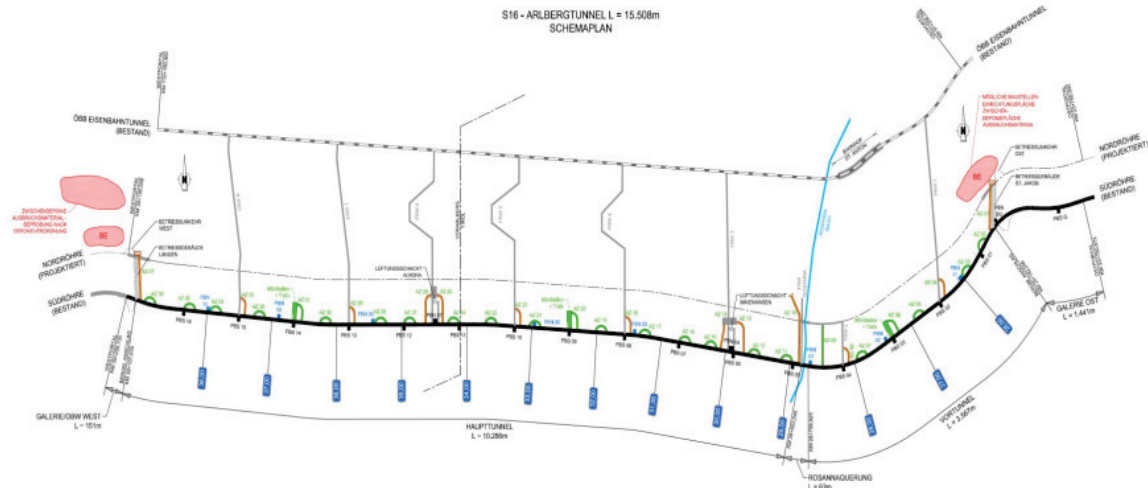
Sketch of the egress ways of the Arlberg tunnel (ASFiNAG)
